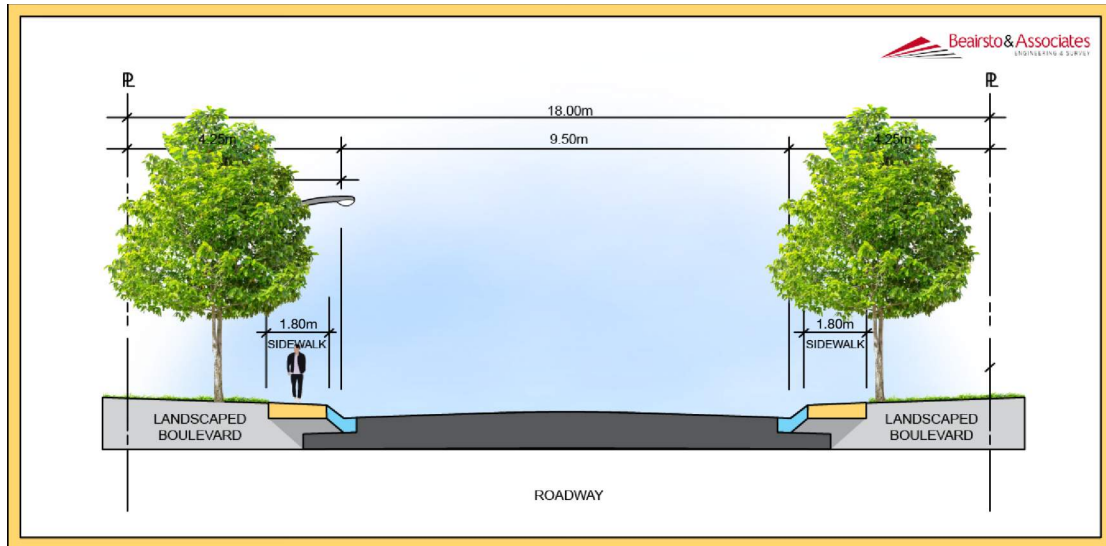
Residential Local Road (Front Driveway Access) Cross Section
